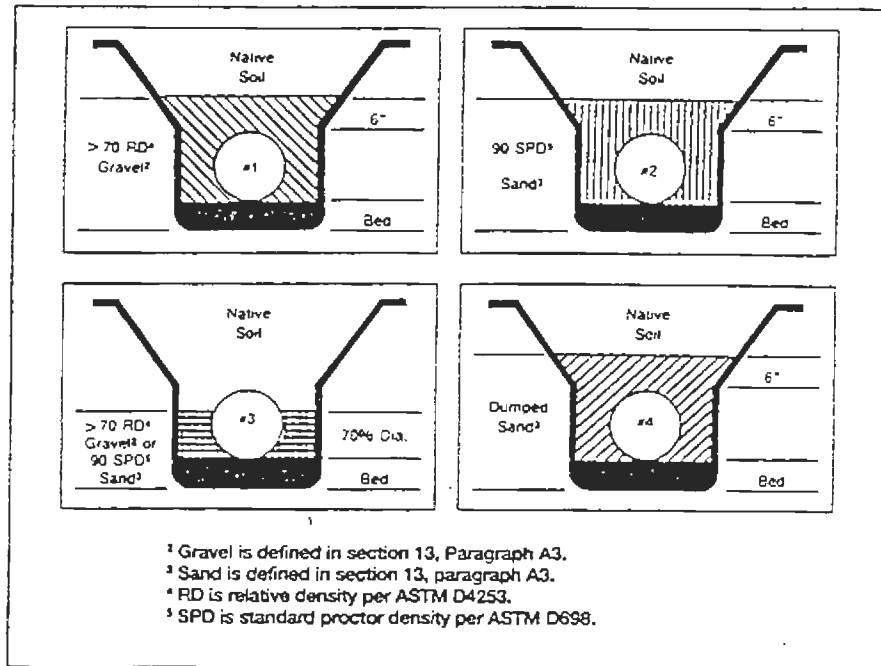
Trench Cross-Sections for Hobas Fiberglass Pipe
